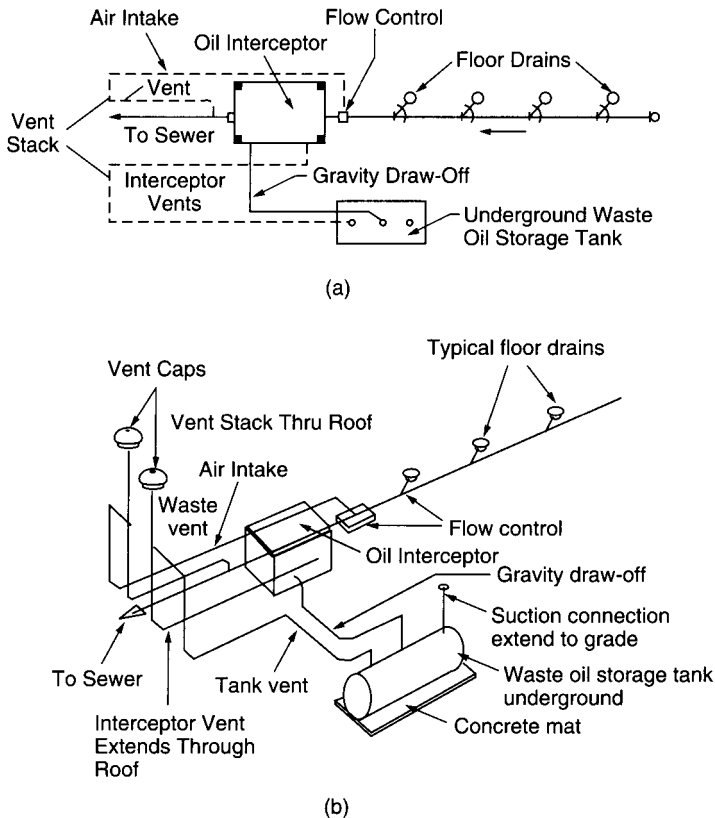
Typical gravity draw-off installation. (a) Plan; (b) isometric.
